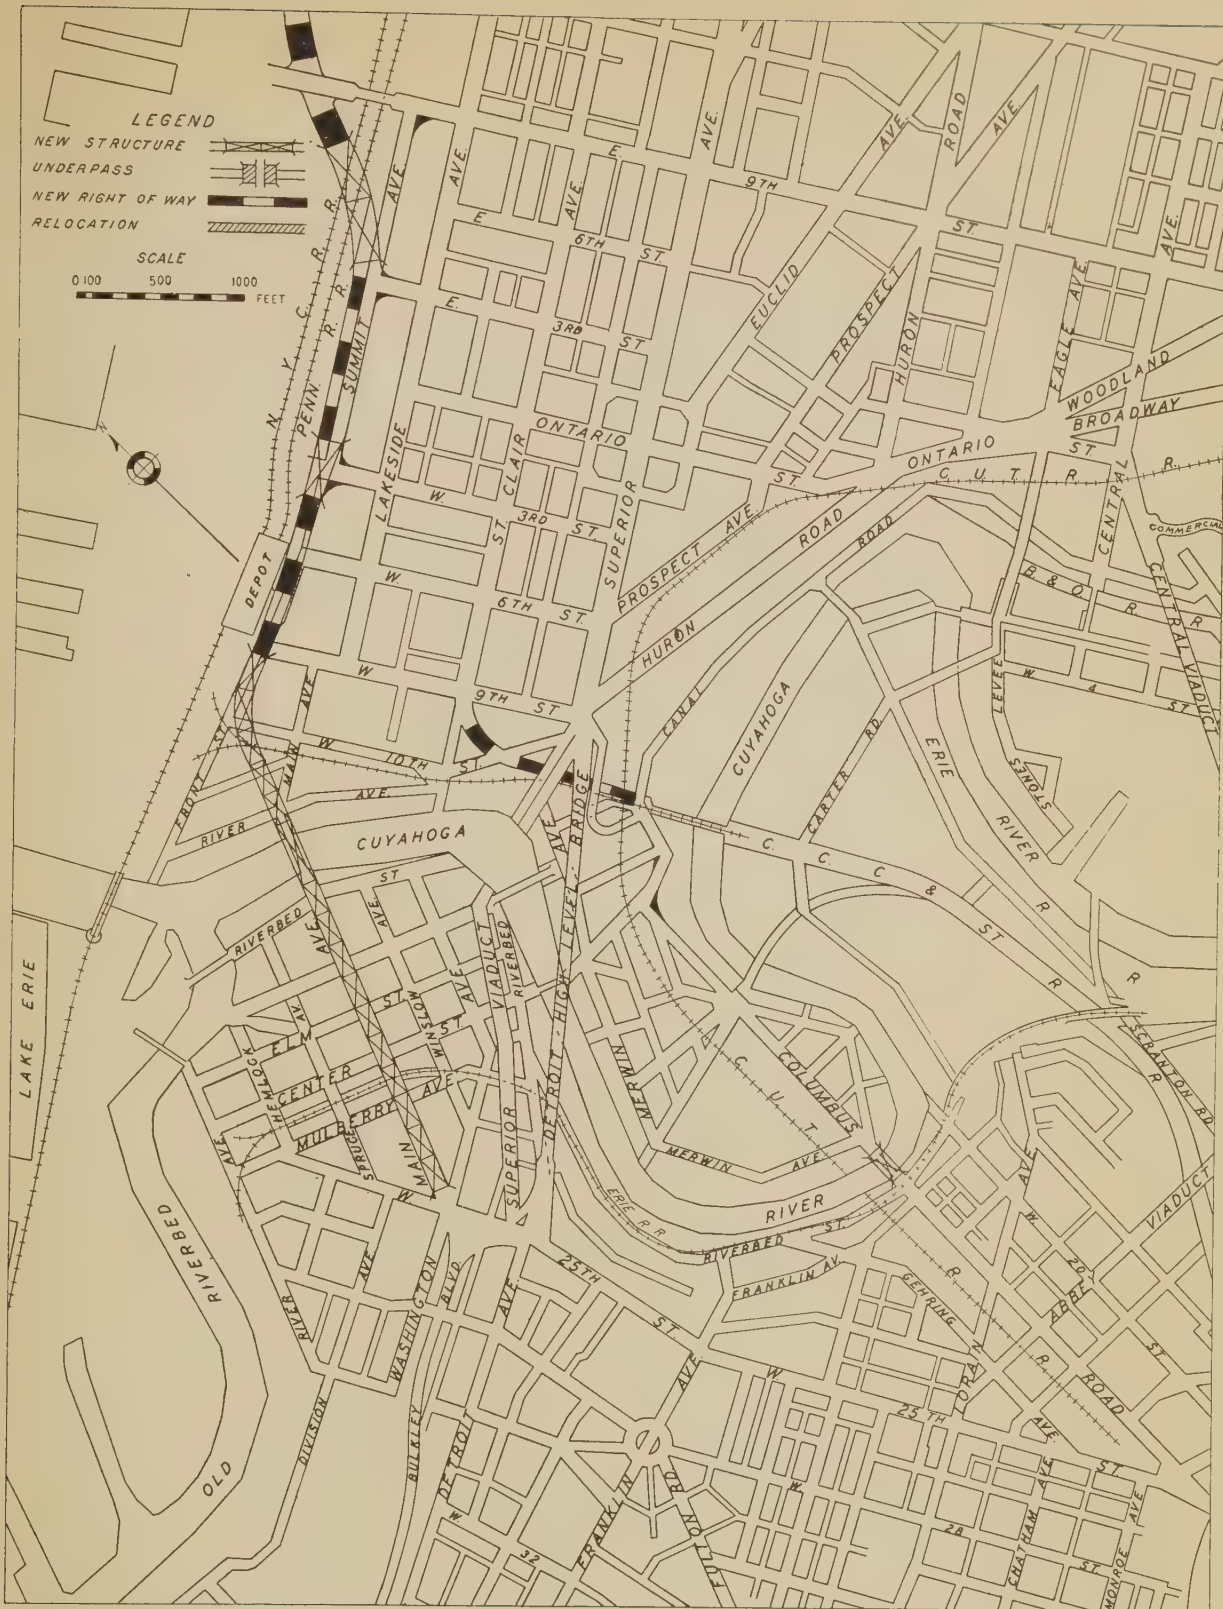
A.—Showing Main Avenue high-level bridge with Lake Front Boulevard connection and Columbus Road
